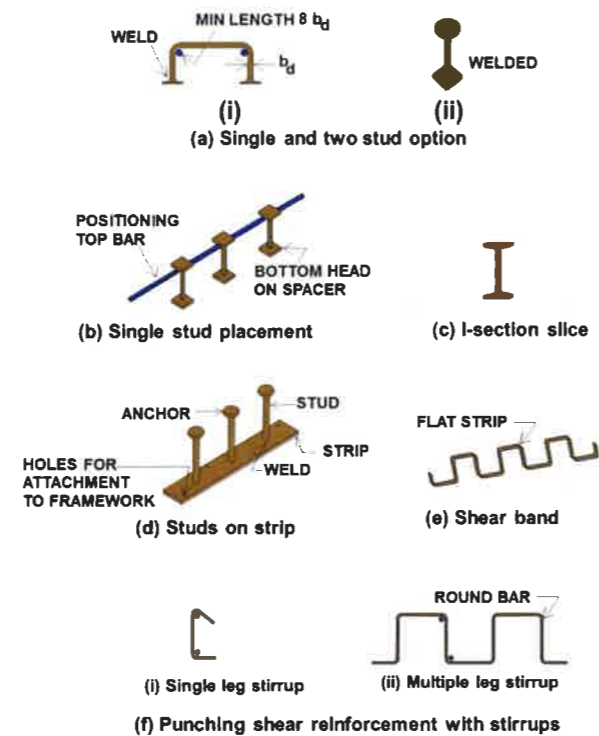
Common Shear Reinforcement Options (P588)
